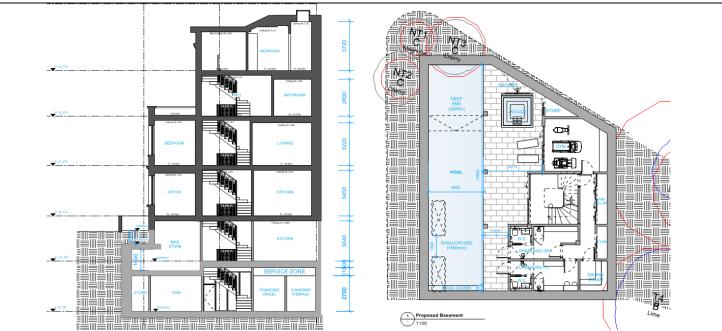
(above): Extract from planning application 2017/2819/P (refused) showing the basement floor level below the existing lower ground floor level
